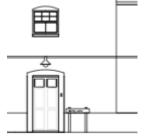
proposed door on Sandy Lane (N) Elevation from 21/2441/NMA
